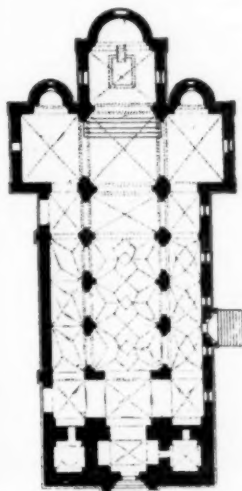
Plan of the Abbey-Church at St. Paul, Lavant Thal.
